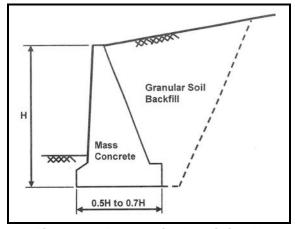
, Gravity Retaining Wall (Earth Retaining Structures – June 2008)
